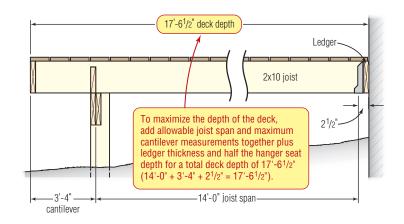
To determine the maximum cantilever for southern pine 2x10s at 16 inches on-center with a 14-foot joist span (the maximum allowable) and a 40-psf live load, follow the 14-foot "Joist back span" column down to the 2x10 row and read the entry—3 feet 4 inches. To maximize the depth of the deck, add the allowable joist span and maximum cantilever measurements together plus the ledger thickness and half the hanger seat depth at the house side of the deck for a total deck depth of 17 feet 6\frac{1}{2} inches.
